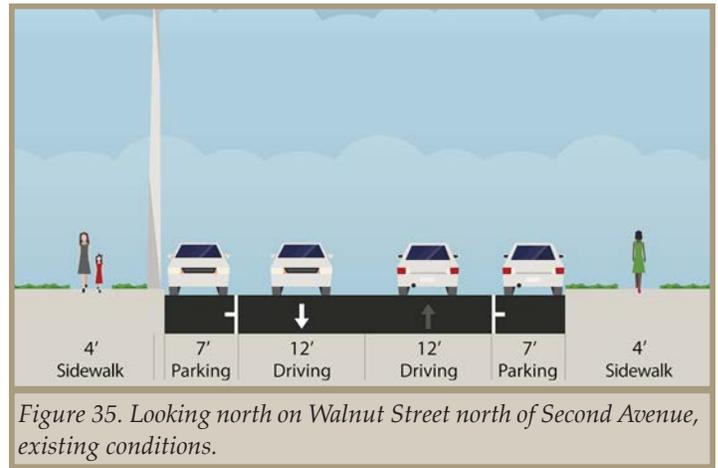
Looking north on Walnut Street north of Second Avenue, existing conditions.
